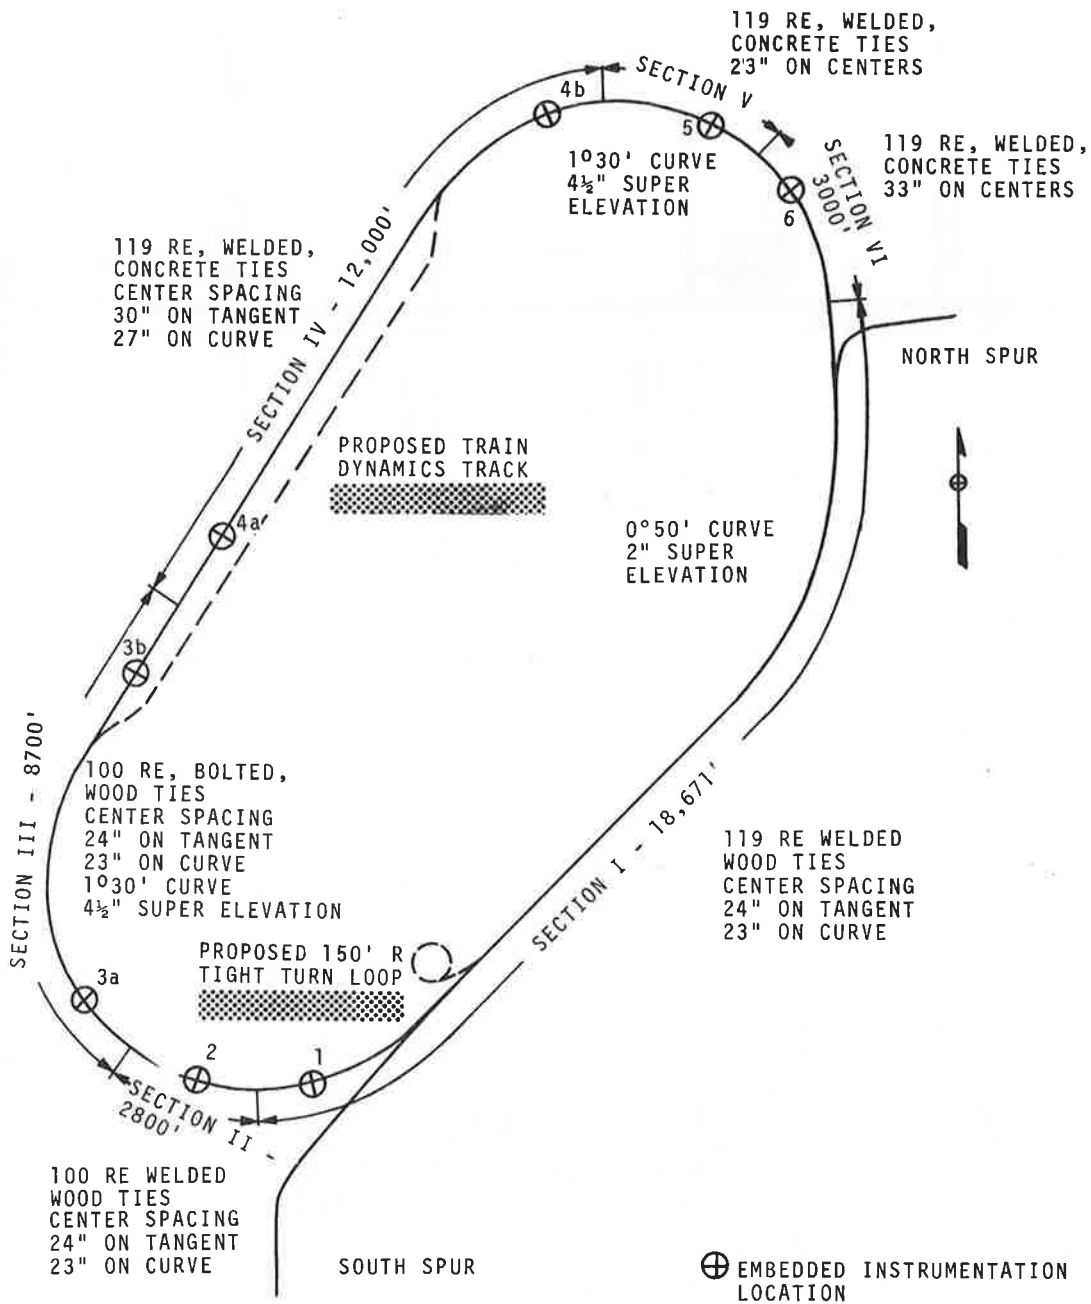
UMTA Rail Transit Test Track Proposed Additions
